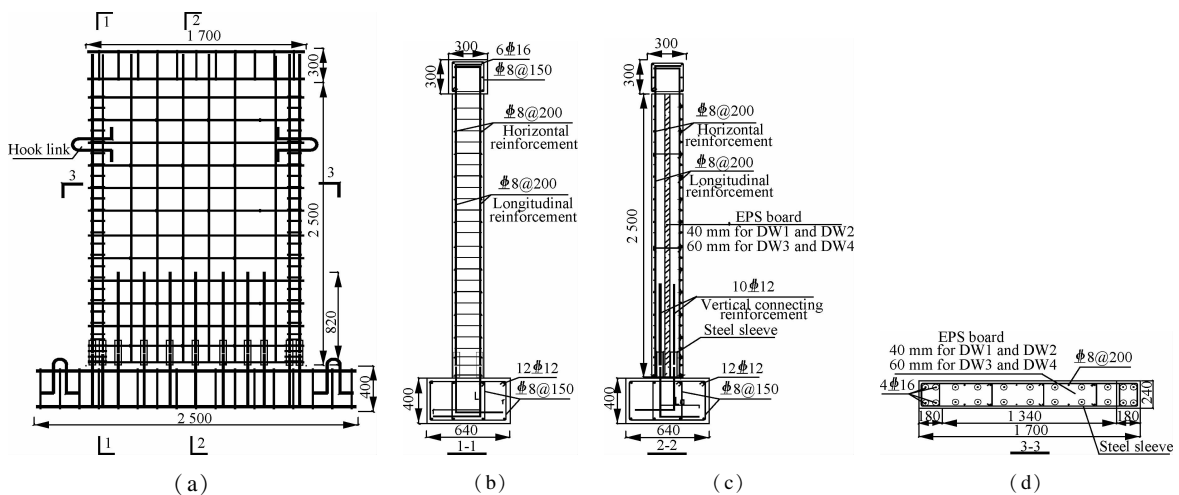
The dimensions of specimens and the reinforcement details (unit:mm). (a) Specimens dimension and reinforcement; (b) Section 1-1; (c) Section 2-2; (d) Section 3-3
